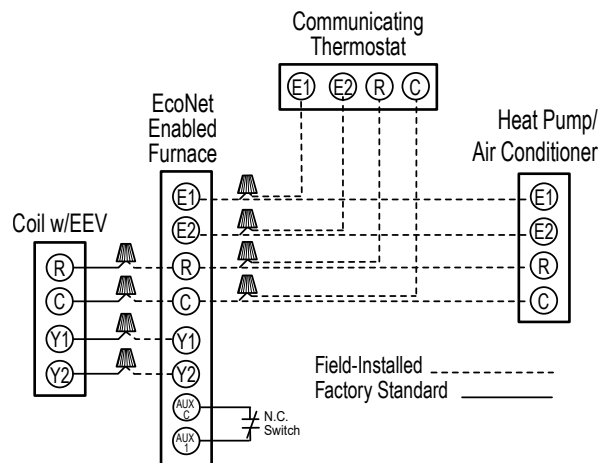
Thermostat Wiring for Heat Pump with Coil and Furnace
